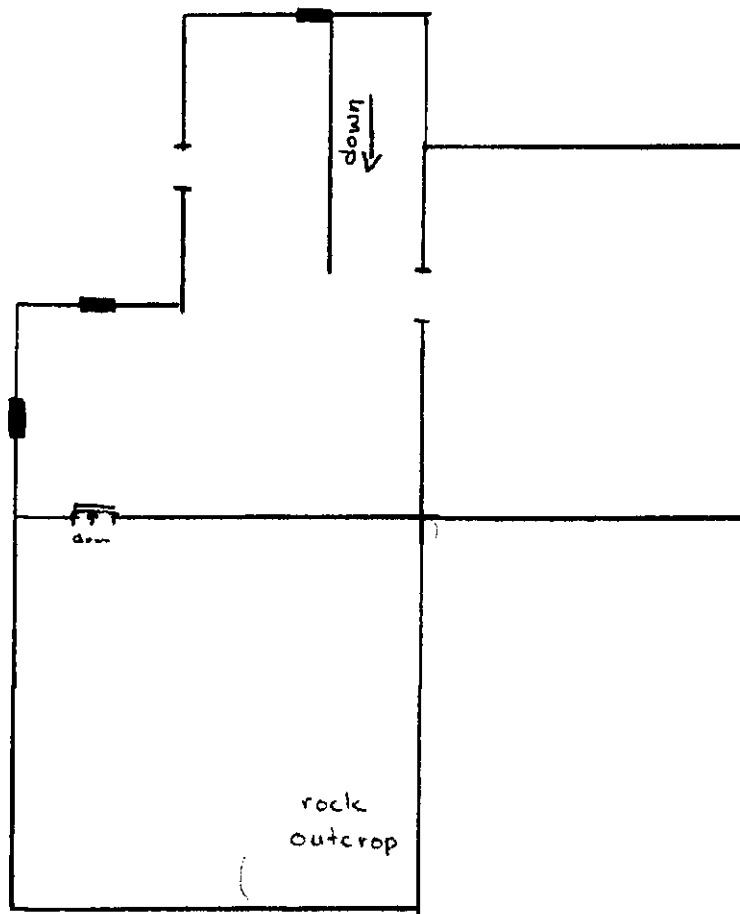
Floor plan of first floor. Drawing by author, 1975.
